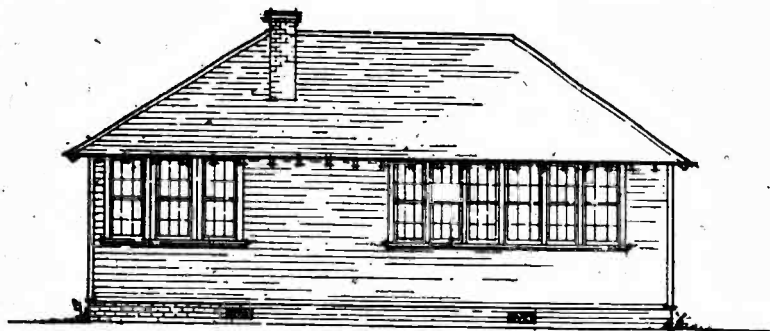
Rear elevation, rural school designed by J. L. Sibley (see p. 107).
